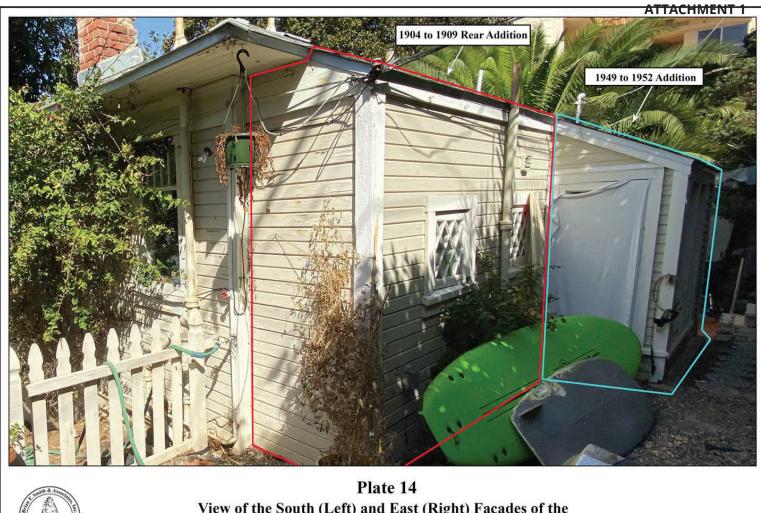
View of the South (Left) and East (Right) Façades of the Dorothy Cottage Showing Modifications, Facing North 825-827 Coast Boulevard South
